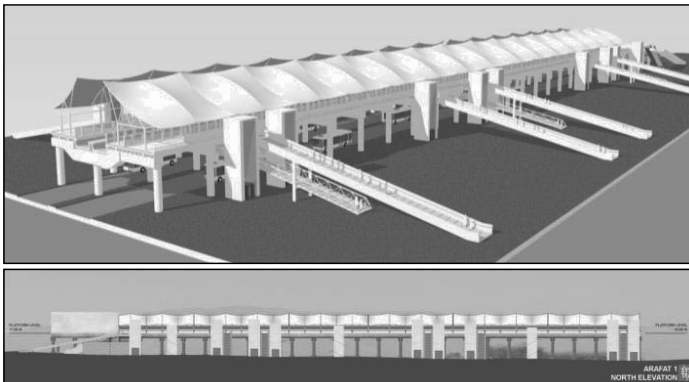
Arafat 1 Station - Perspective & Elevation General View
